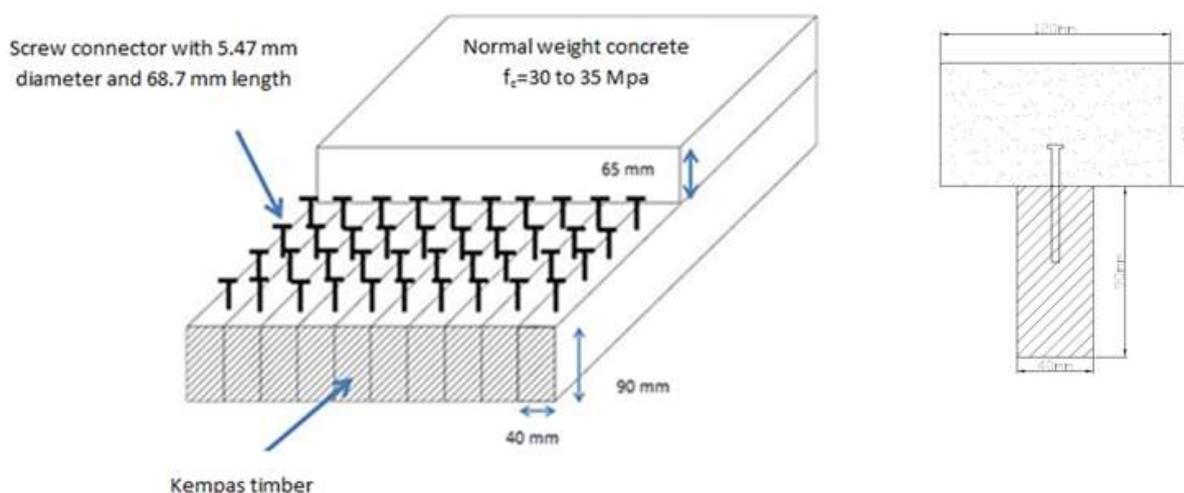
Cross section for Timber concrete composite (TCC) deck(Left) and Single TCC1(T section) Right.
